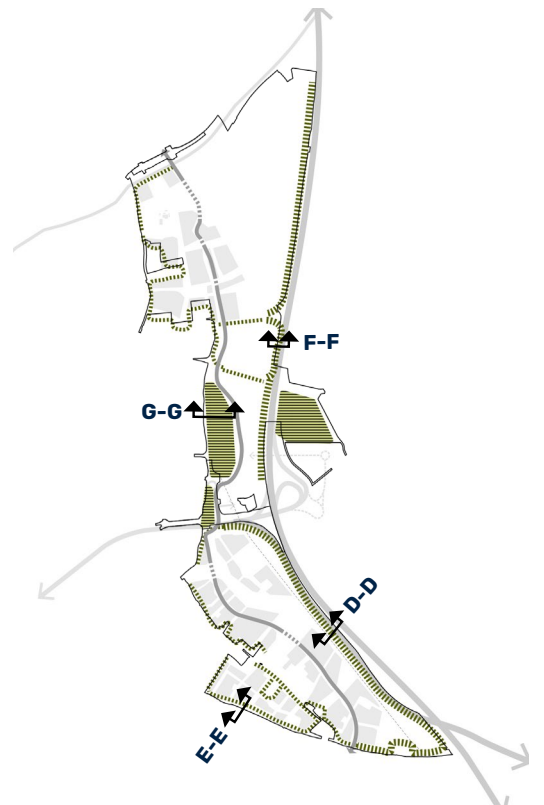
Section location plan D-D, E-E, F-F, G-G
